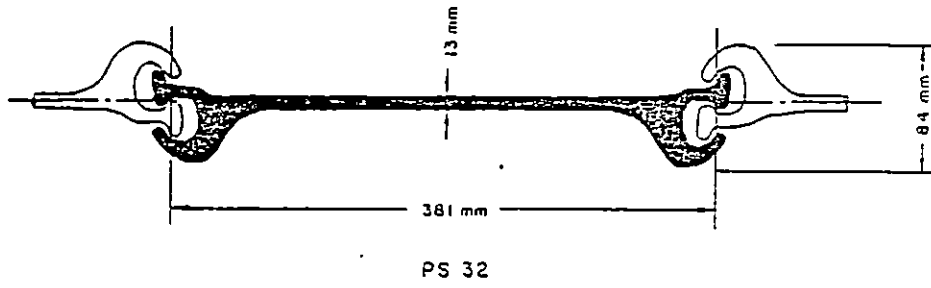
Details of Straight Web Piling (U.S. Steel Handbook)
